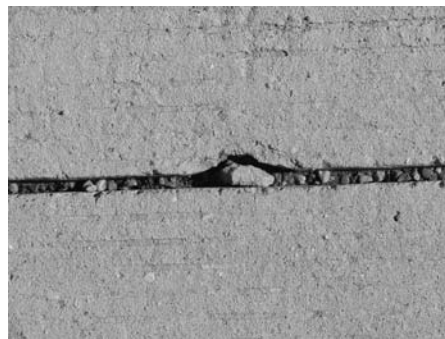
Low severity spalling of unsealed narrow contraction joints at test section S2
